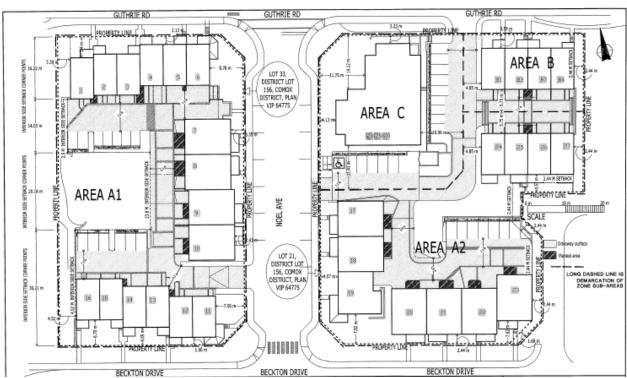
1245 and 1263 Guthrie Road Sub-Areas and Setbacks
